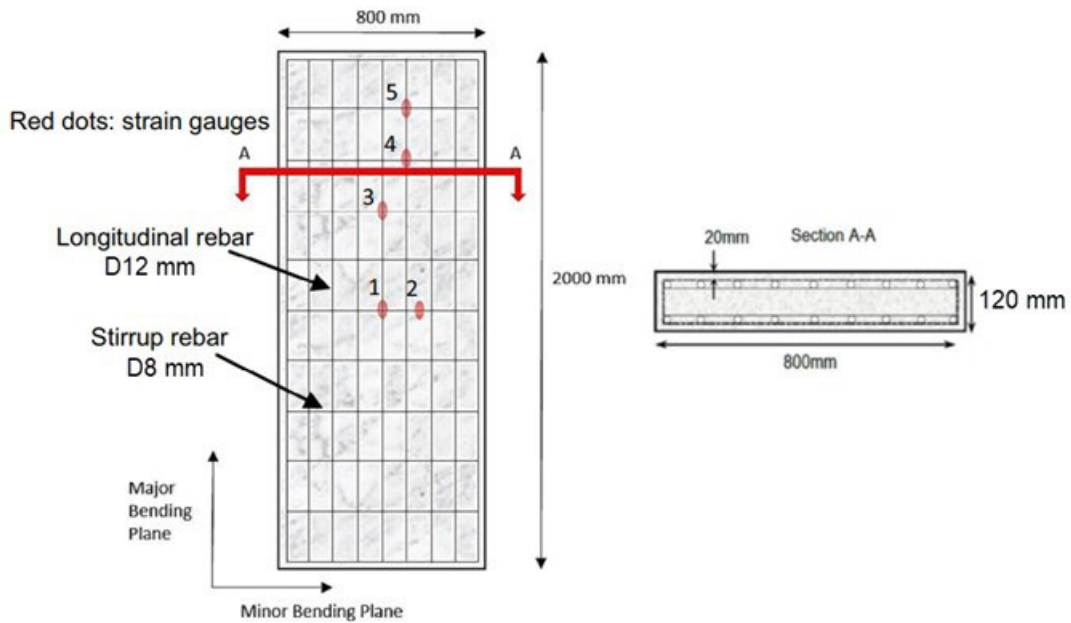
Reinforcement layout of slab specimens tested by Li et al. [10]
